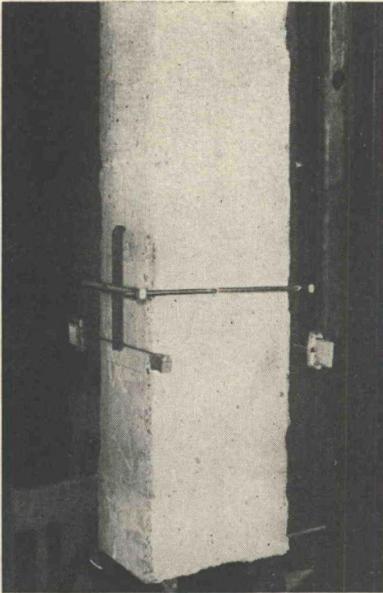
A Pair of Marten's Mirror Extensometers on Opposite Faces of a Specimen.
